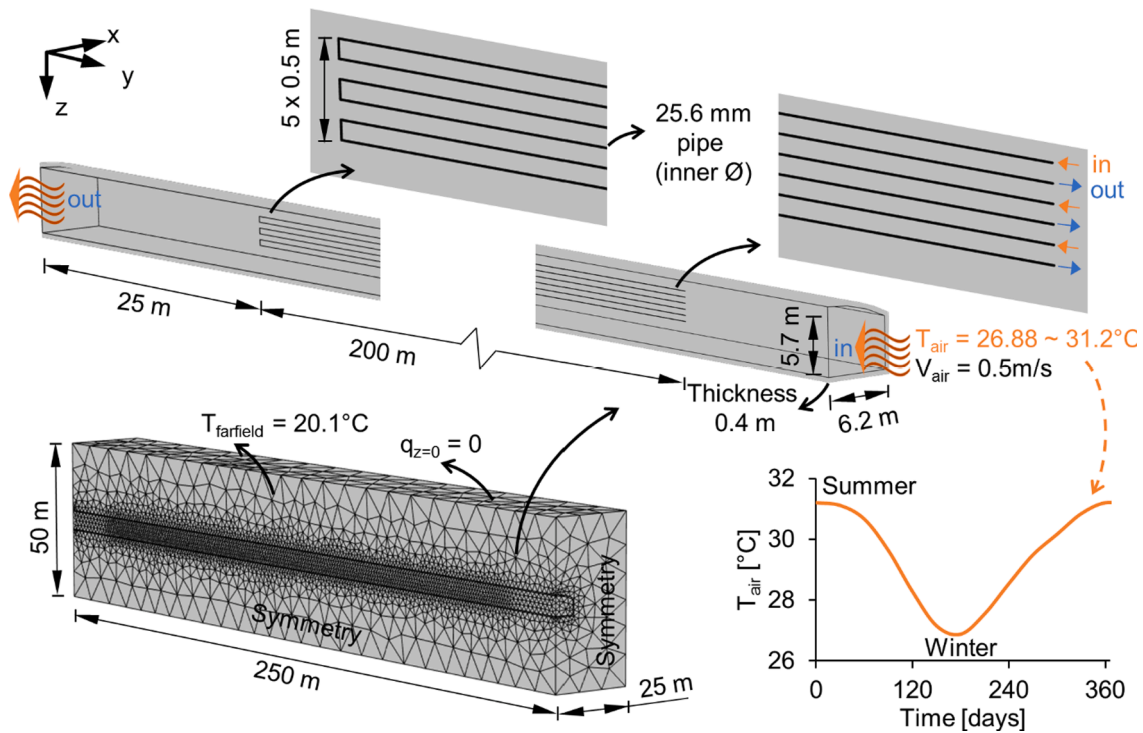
Geometry, pipe configuration and boundary conditions of the modelled tunnel section.
